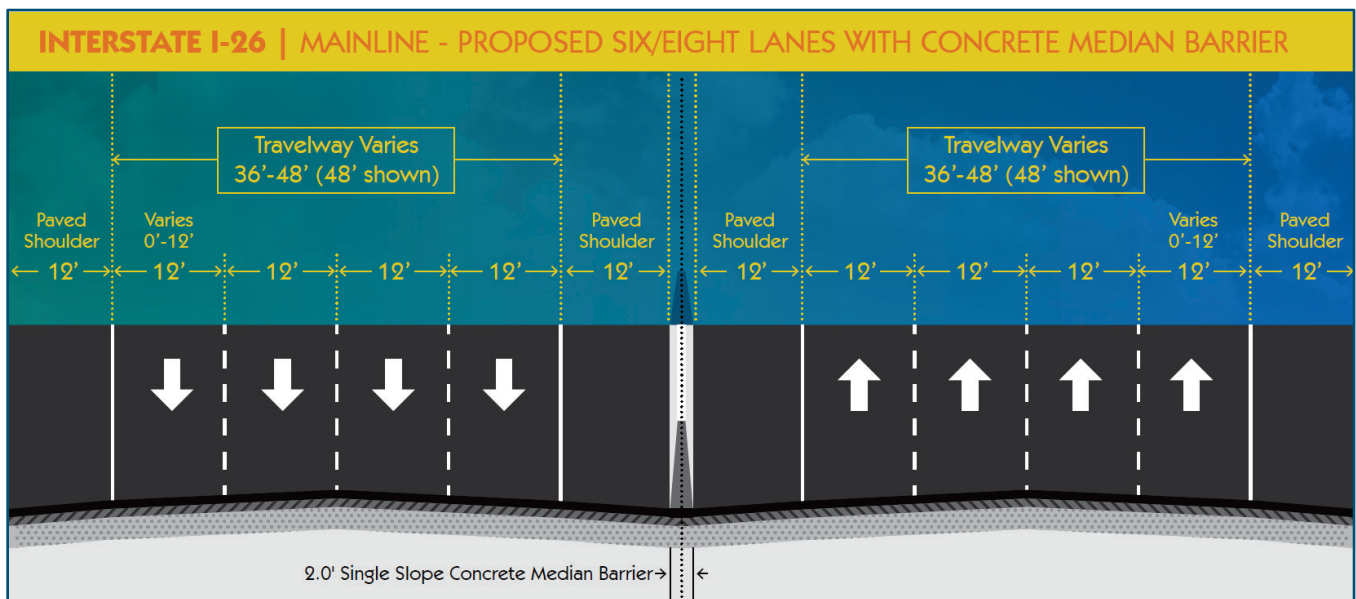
Proposed mainline alternative – six/eight-lanes with concrete median barrier
